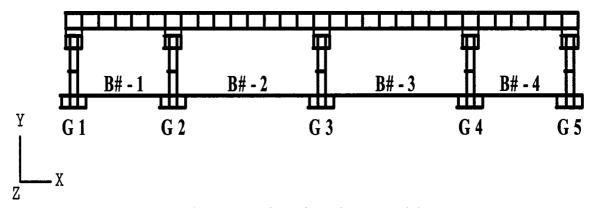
Models Used for Bridge Analysis – Five Girders Model
